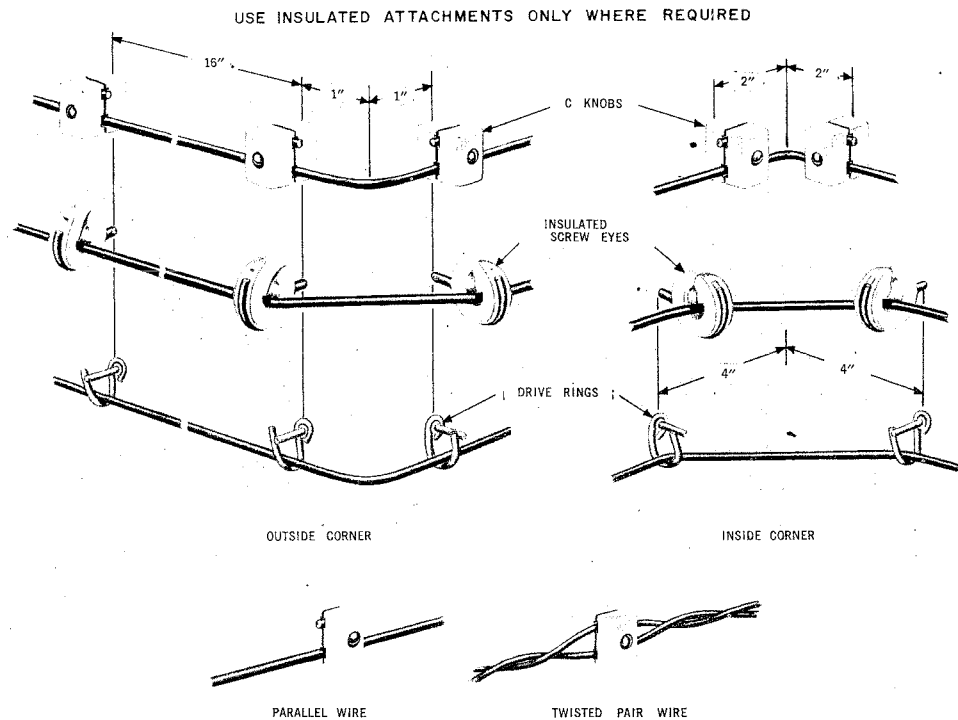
Fastening Drop and Block Wire Inside of Buildings
